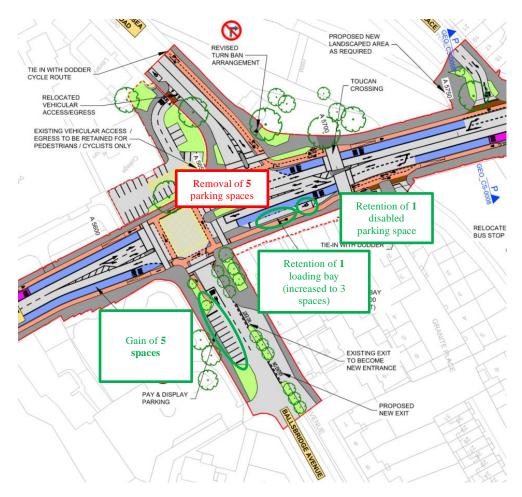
Proposed scheme design on Merrion Road in Ballsbridge
